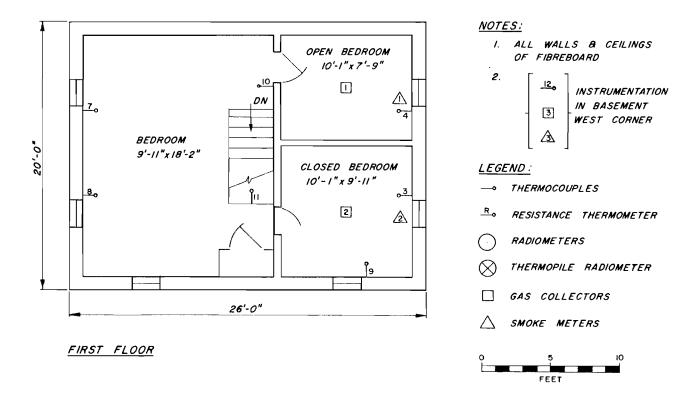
BUILDING No. 3 - TWO - STOREY SOLID BRICK DWELLING
